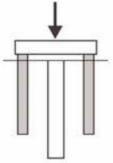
Install new foundations avoiding old foundations and transfer structural loads to the new foundation (Chapman et al. 2007).
